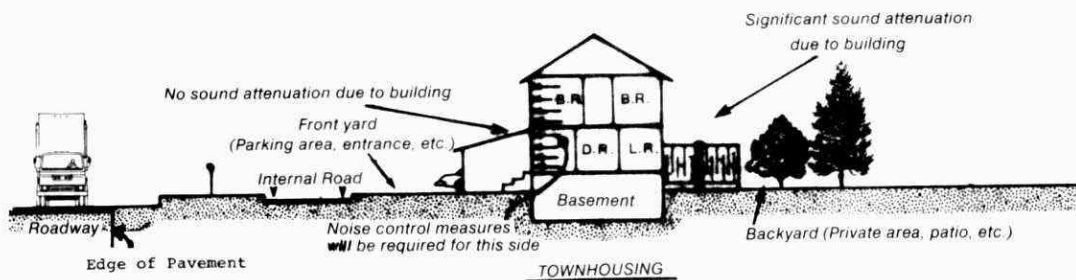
The Use of Building Barriers to Create an Acoustical Shadow Zone
